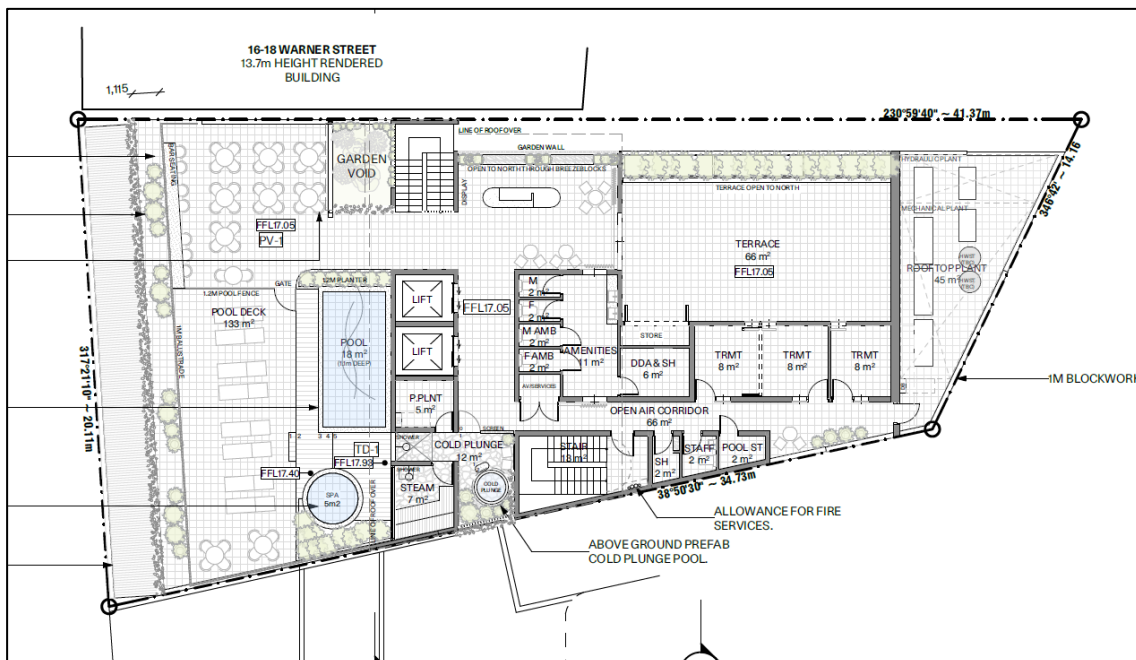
Proposed Upper Level (Source: Wolveridge Architects)
